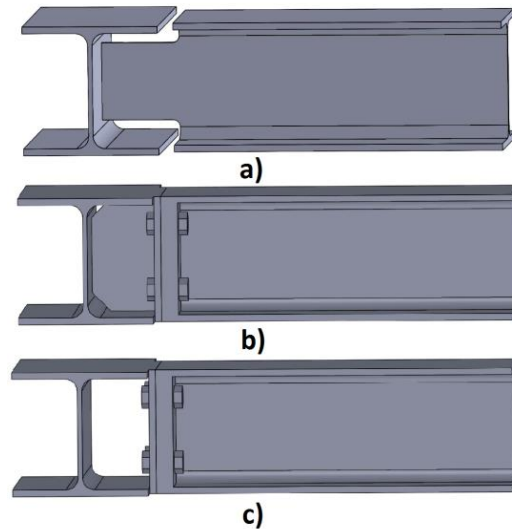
Beam-to beam typology. a) Welded, b) Bolted with T shape stub and c) Bolted with additional plate.
